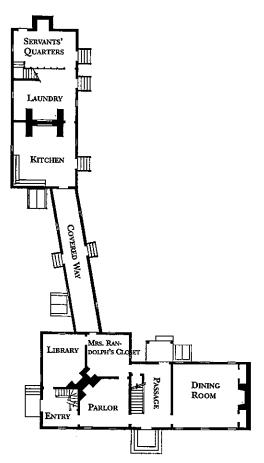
First-floor plan of house, covered way, and kitchen-laundry-quarter as it will appear when reconstruction of the rear wing is completed. Investigations are continuing into the original configuration of the main stair. Drawing by Mark R. Wenger, 1999.
